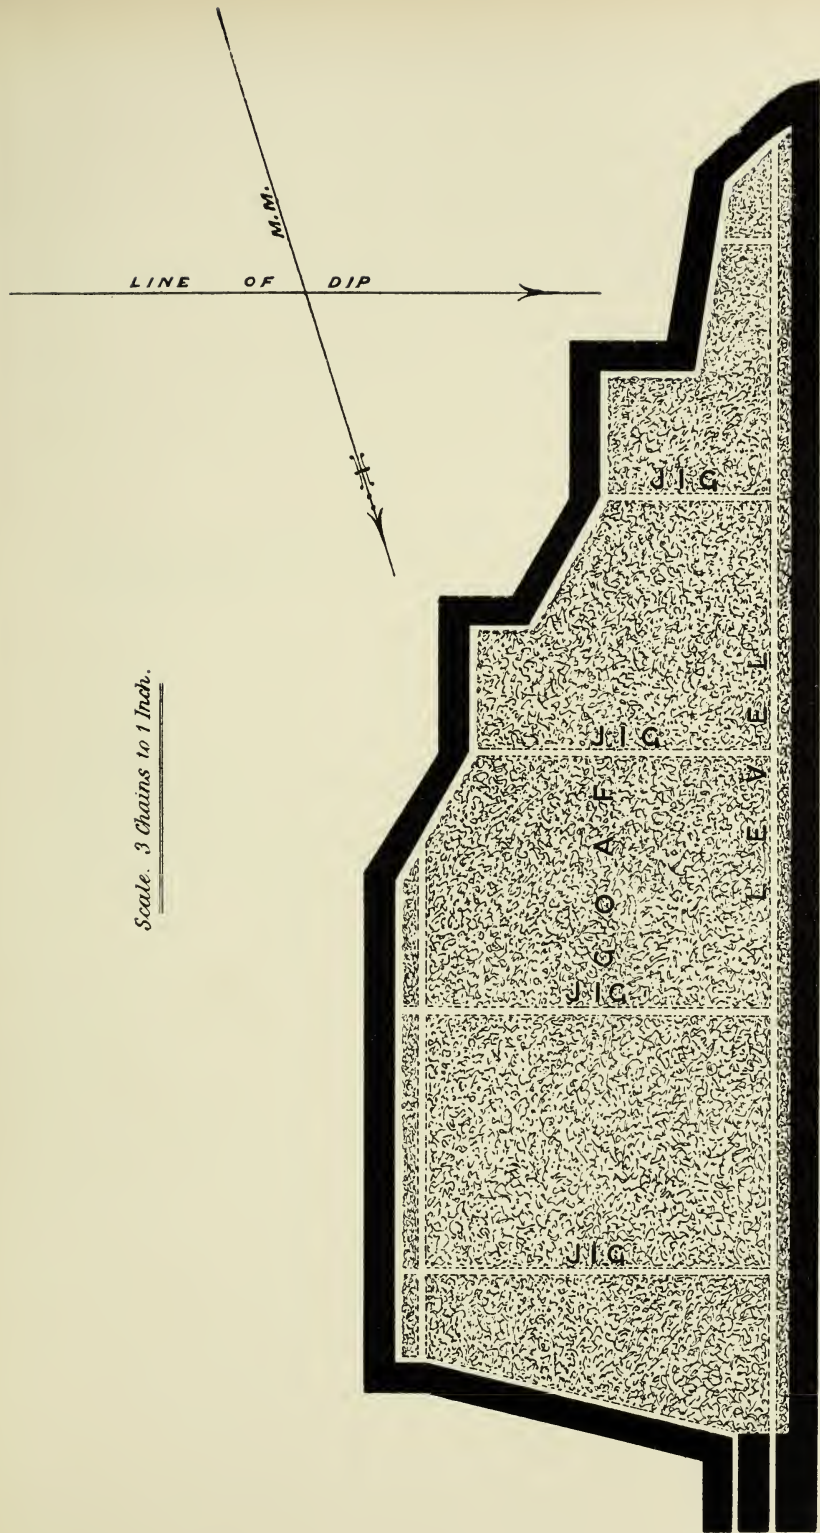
FLORENCE COLLIERY, LONGTON, NORTH STAFFORDSHIRE. PLAN SHOWING LONGWALL METHOD OF WORKING THE GREAT ROW SEAM.
